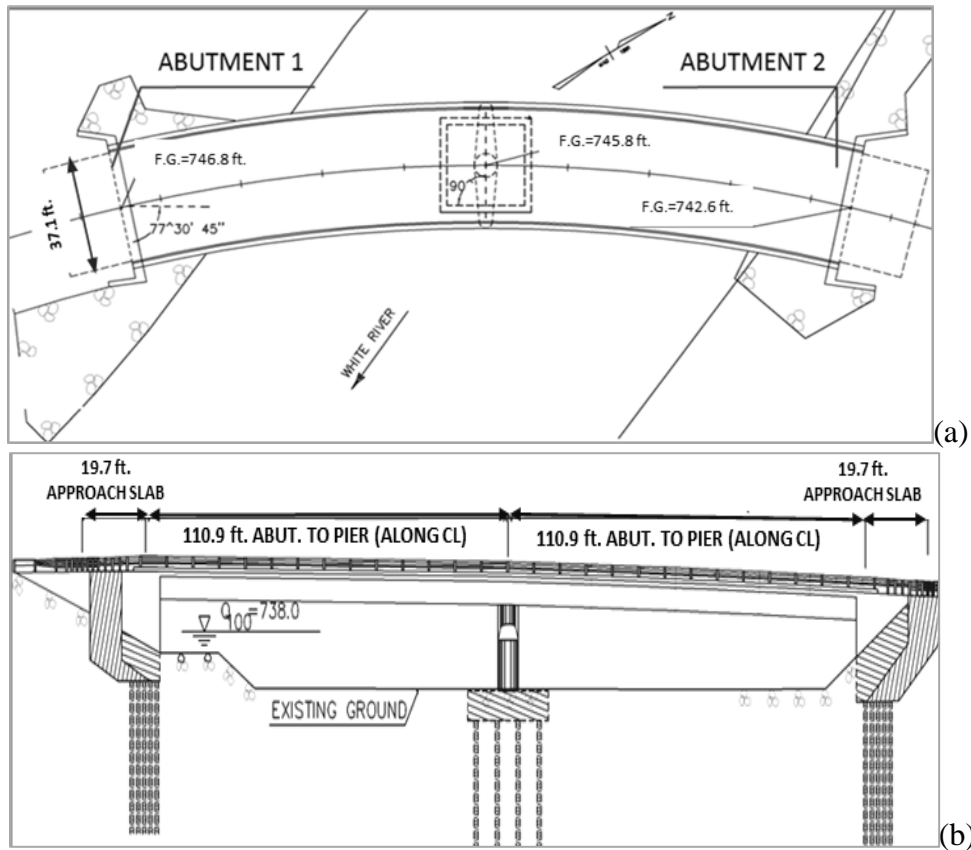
Stockbridge Bridge (a) plan view (b) elevation view
